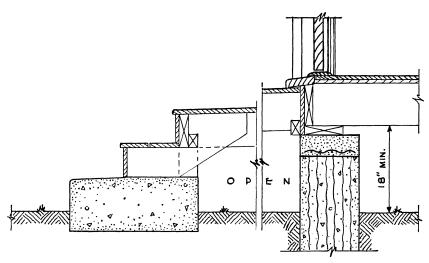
Wooden steps protected from hidden infestation by resting carriage on a poured-concrete base which forms the lower step. Platform attached to building above the poured-concrete cap on foundation wall or pier.
